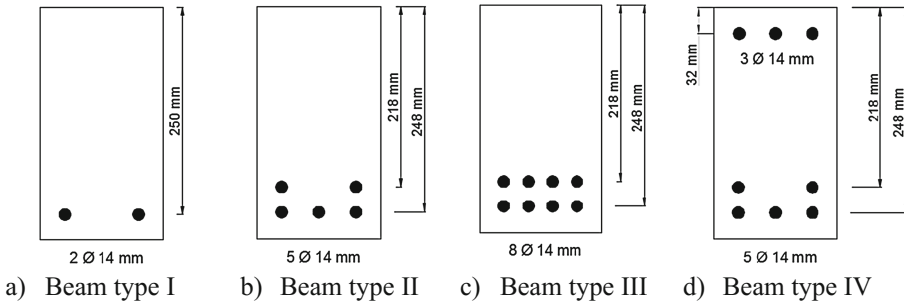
Cross-section of the four different reinforced concrete beam types.
